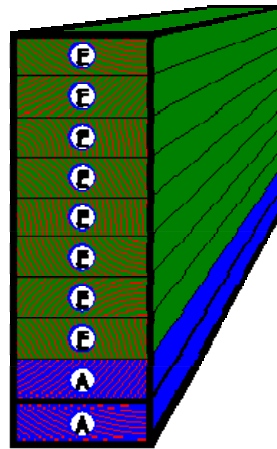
Example of the GLULAM beam (E) reinforced with timber lamellas of higher strength (A)
